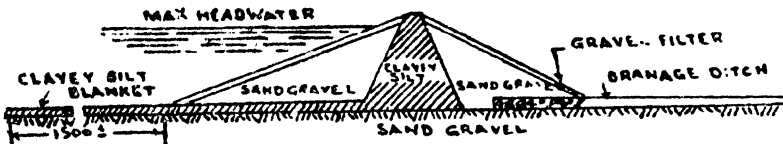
Suitable design for a site where both sand gravel and clayey silt are available and foundation is highly pervious to a great depth.
